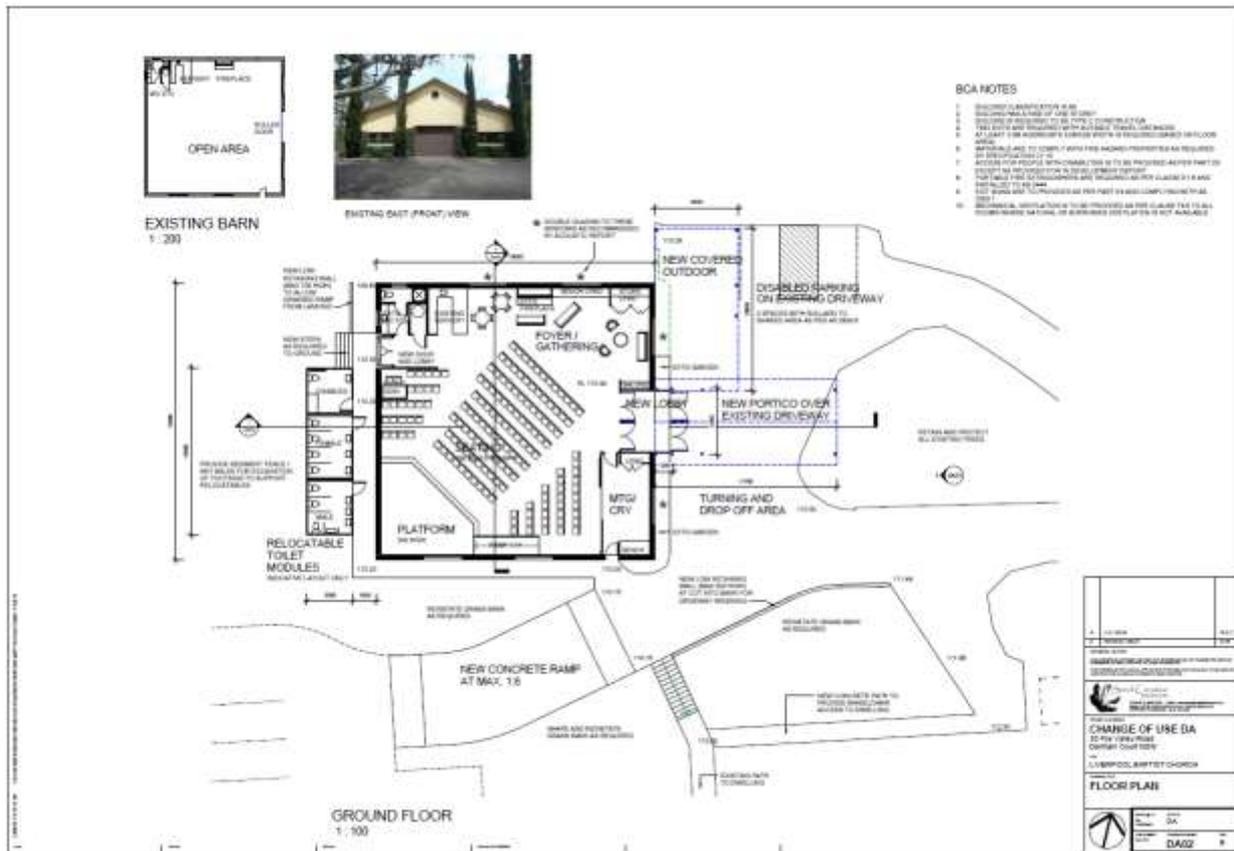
Ground floor plan of proposed place of public worship at 30 Fox Valley Road, Denham Court.
